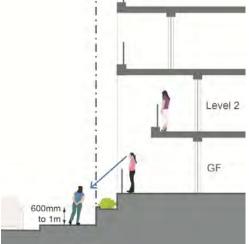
Where the ground floor of a building must be more than 1m above the footpath, consider providing a planter 600 mm to 1 m above the footpath to soften the building interface.
